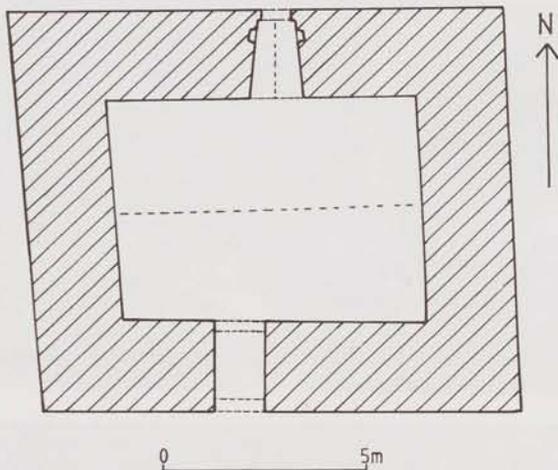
Sīrīn (No. 137). Plan of medieval building.
